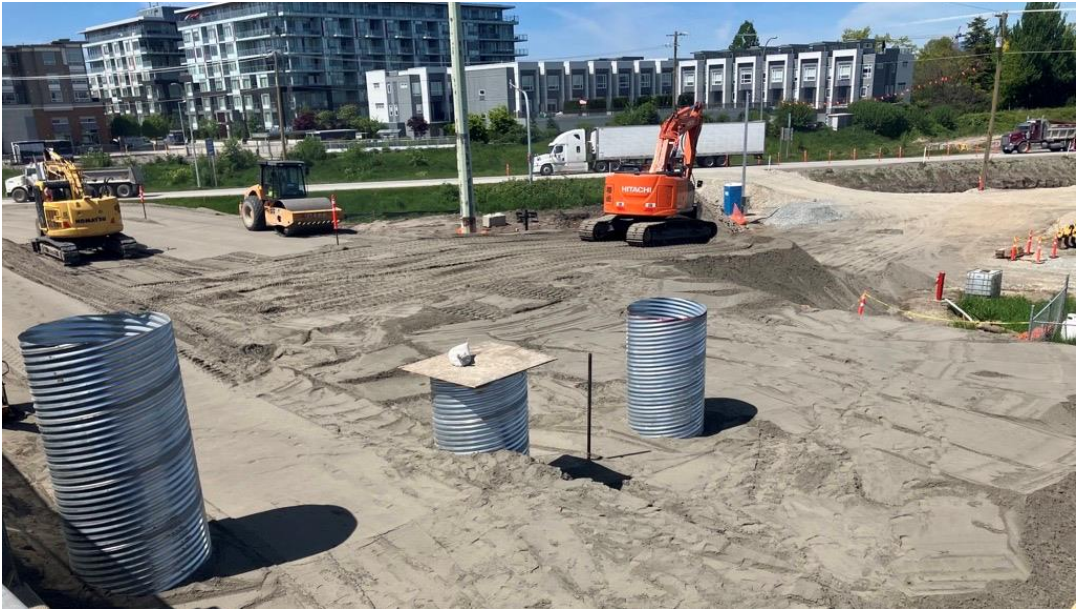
PLACEMENT OF BACKFILL AT BRIDGE ABUTMENTS
